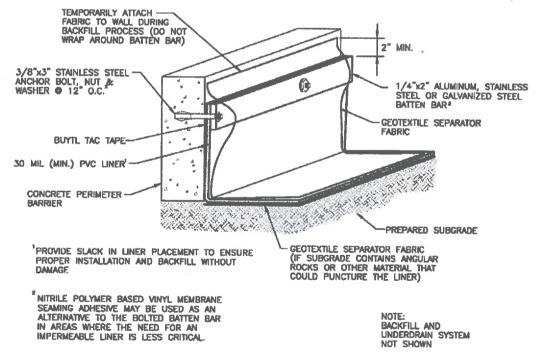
Geomembrane Liner/Concrete Connection Detail
